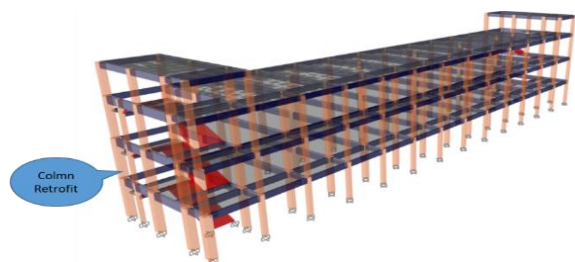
The 3-D modeling of retrofitted SMPN 25 Padang building with concrete jacketing.
